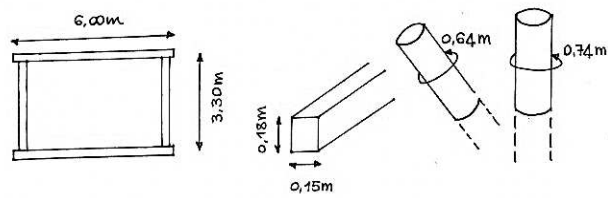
Cableway tower base sketches from fieldwork: big, medium and small structure
